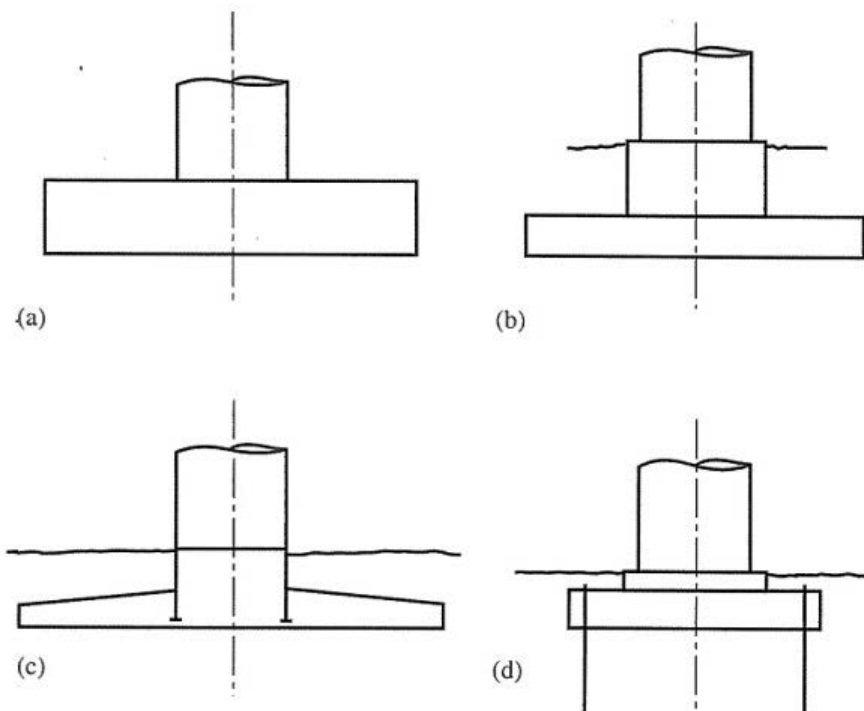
(a) Plain slab; (b) Stub and pedestal; (c) Stub tower embedded in tapered slab; (d) Slab held by founding anchors
